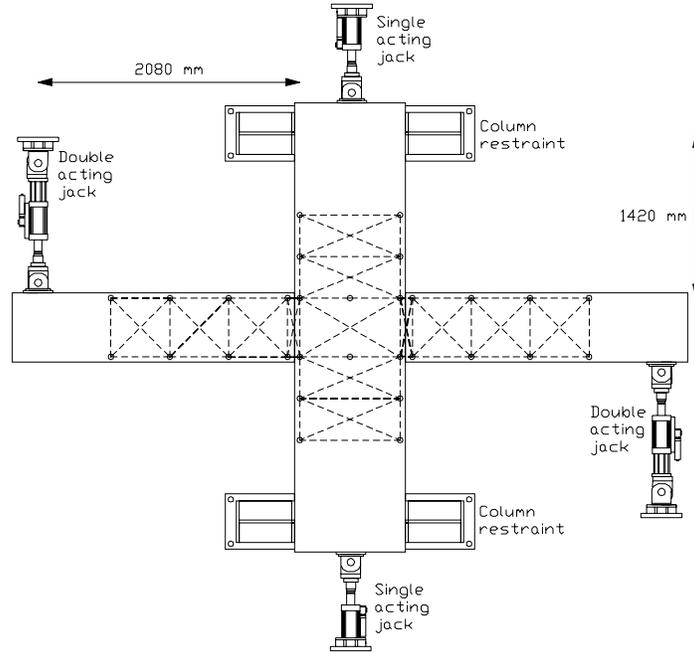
Portal gauge layout and loading arrangement for unit 1B and 2B.
